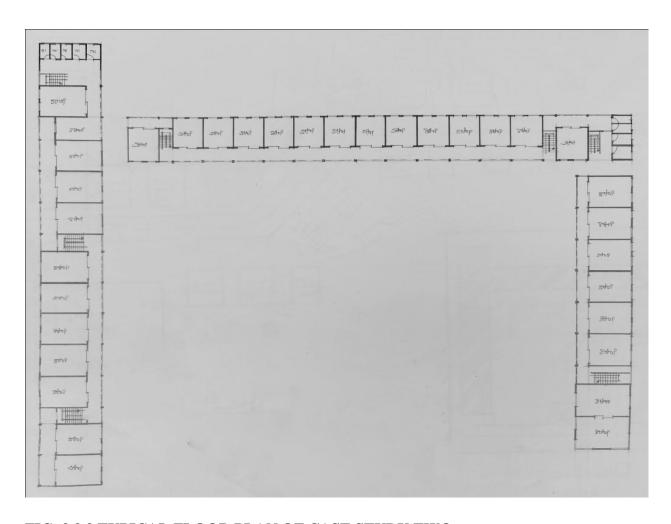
TYPICAL FLOOR PLAN OF CASE STUDY TWO
